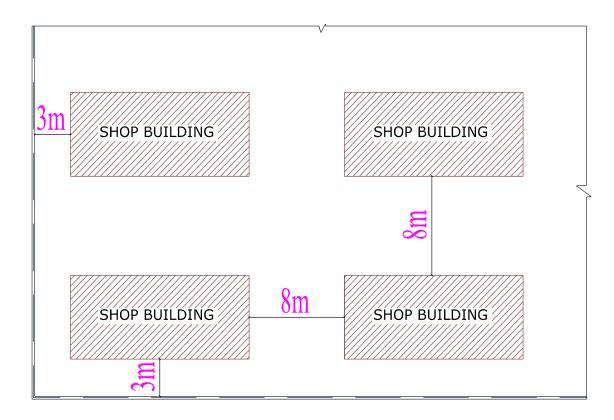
Part of the proposed site plan of a market with the spaces of eight metres between shop buildings.
